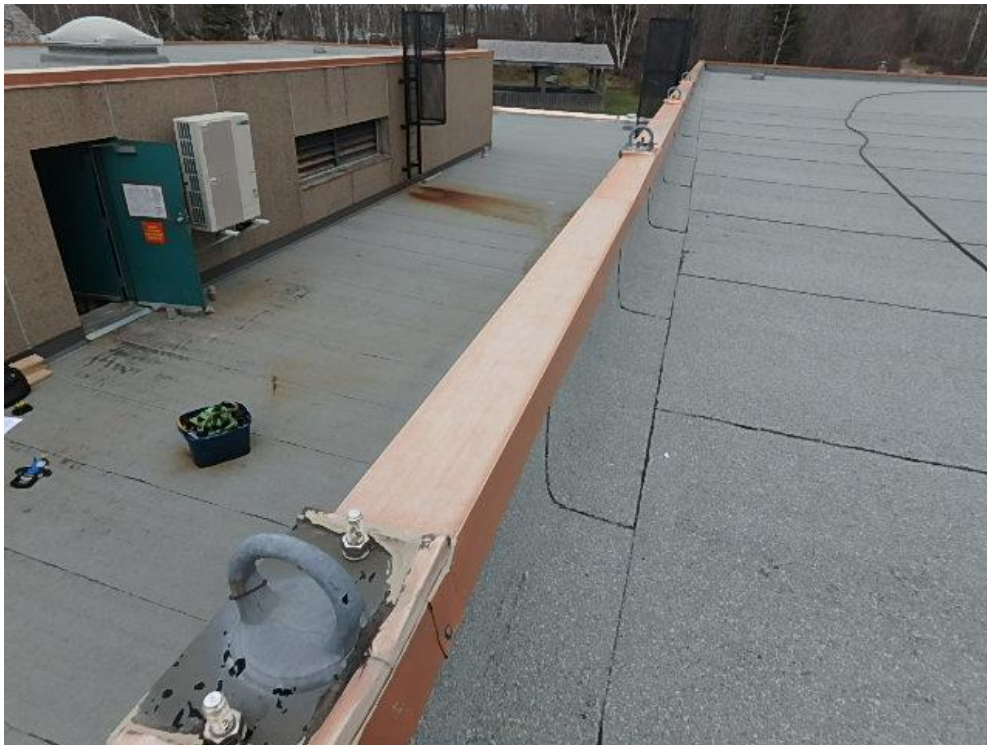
Roof Area 2.2 – Showing conduit penetration into wall, wall louvre with water staining on membrane and air conditioner on pavers with cap sheet as membrane protection.
